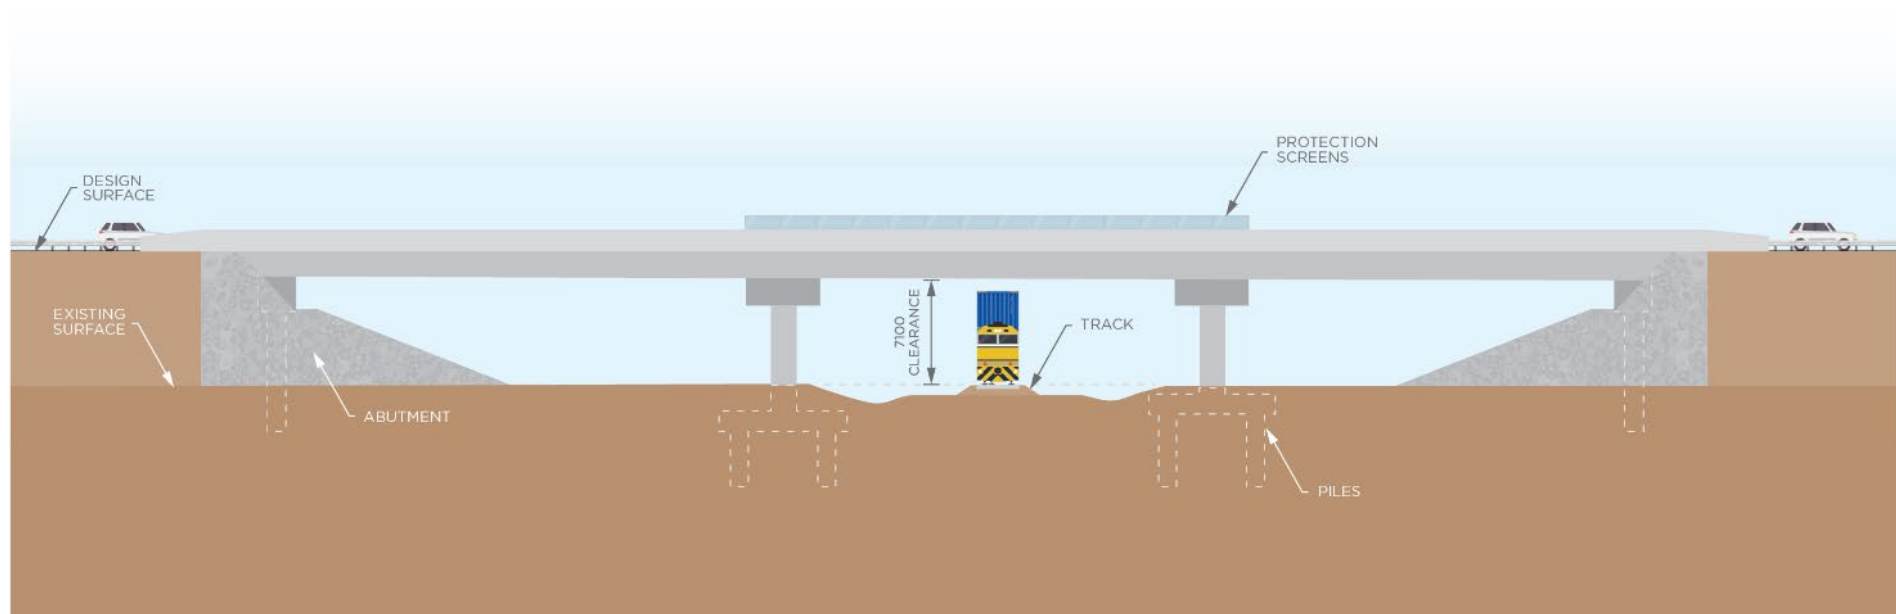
TYPICAL SECTION OF ROAD-OVER-RAIL BRIDGE STRUCTURE
